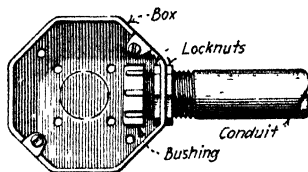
Proper connection between box and conduit when conduit is cut a little too long.
